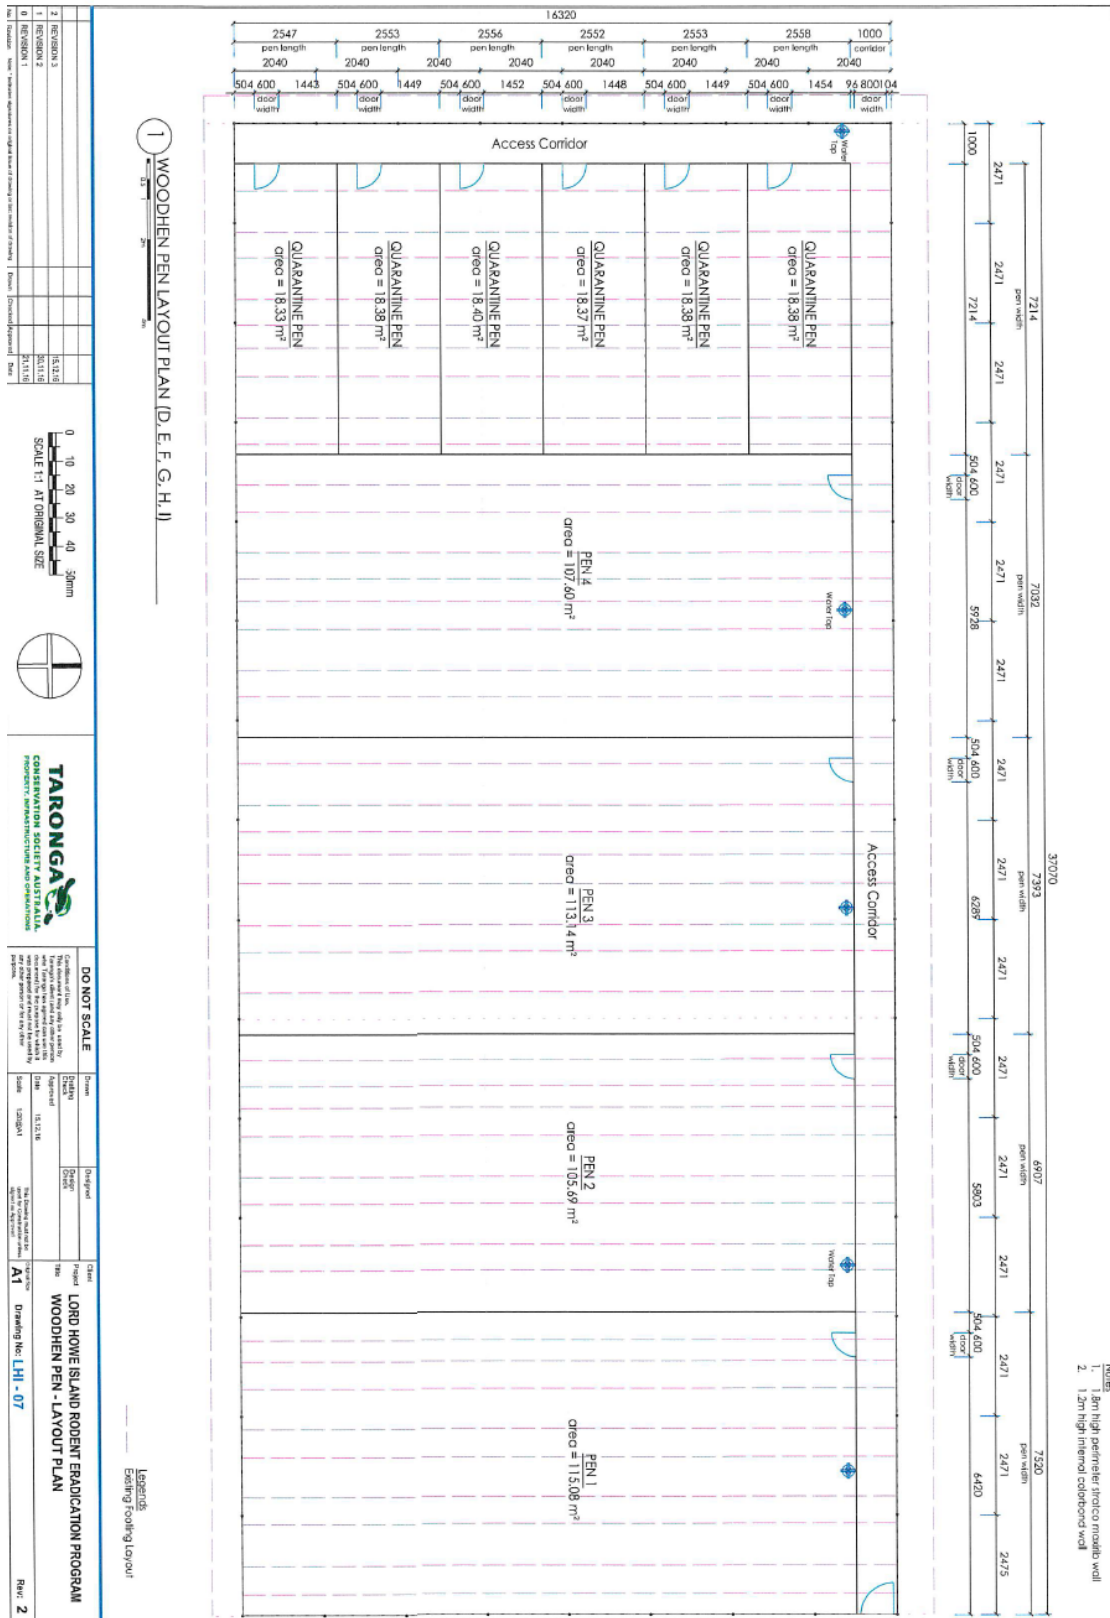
LHI Woodhen Pen D, E, F, G & I Layout Plan
